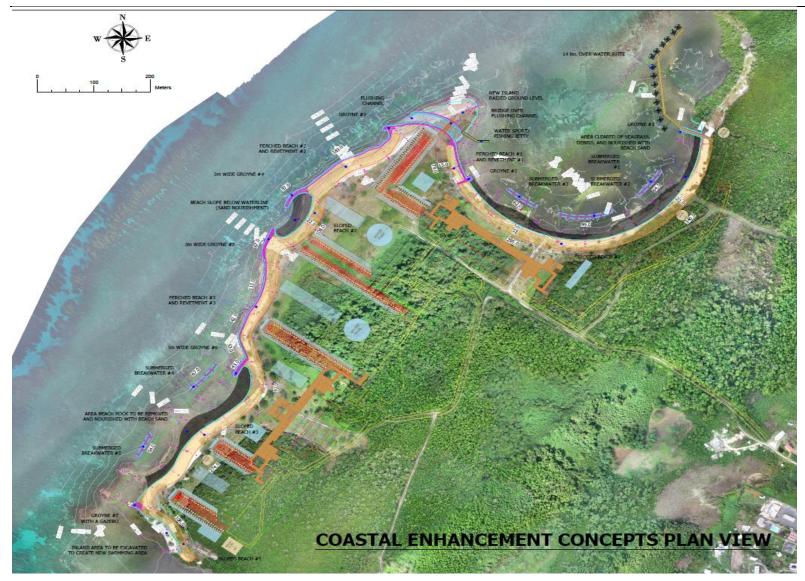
Site plan of proposed coastal enhancement works at Princess Resort, Hanover
